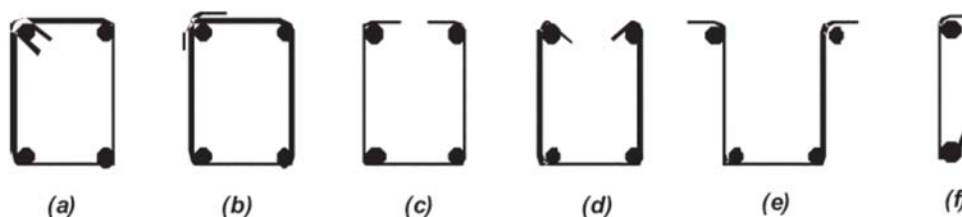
Typical stirrup shapes for girders and beams.
